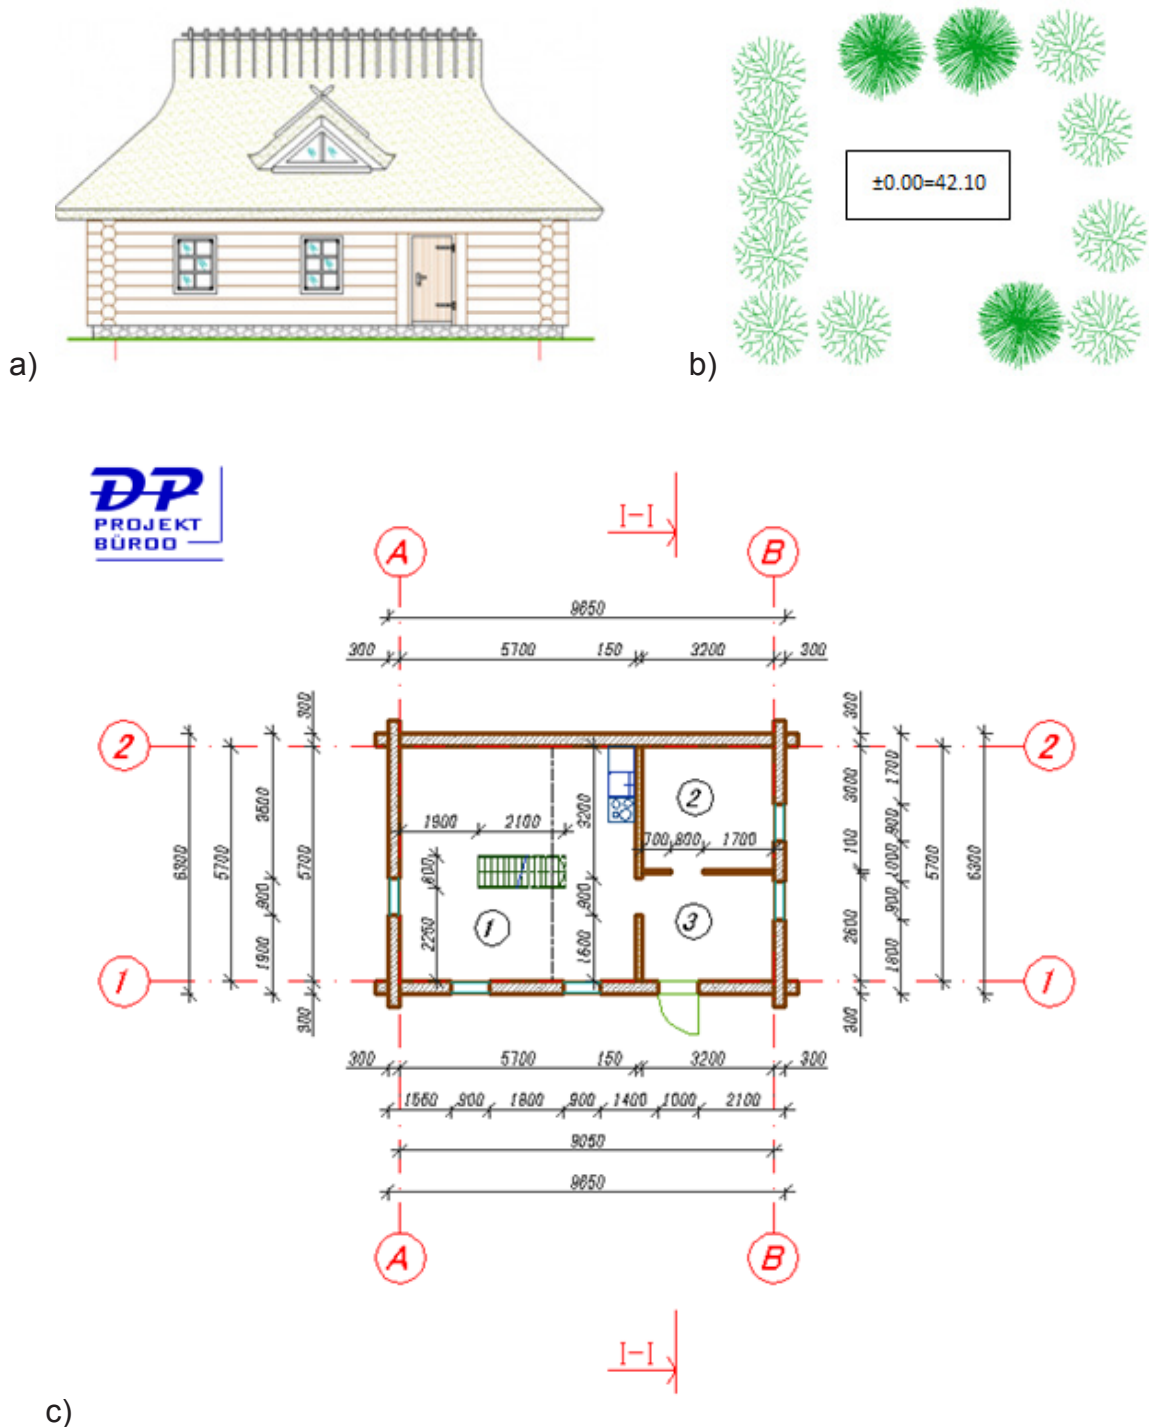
Forms of representation of the dwelling house: façade - pictorial drawing a); graphic symbol on site plan b); floor plan (source: <http://dpprojekt.ee>) c)
